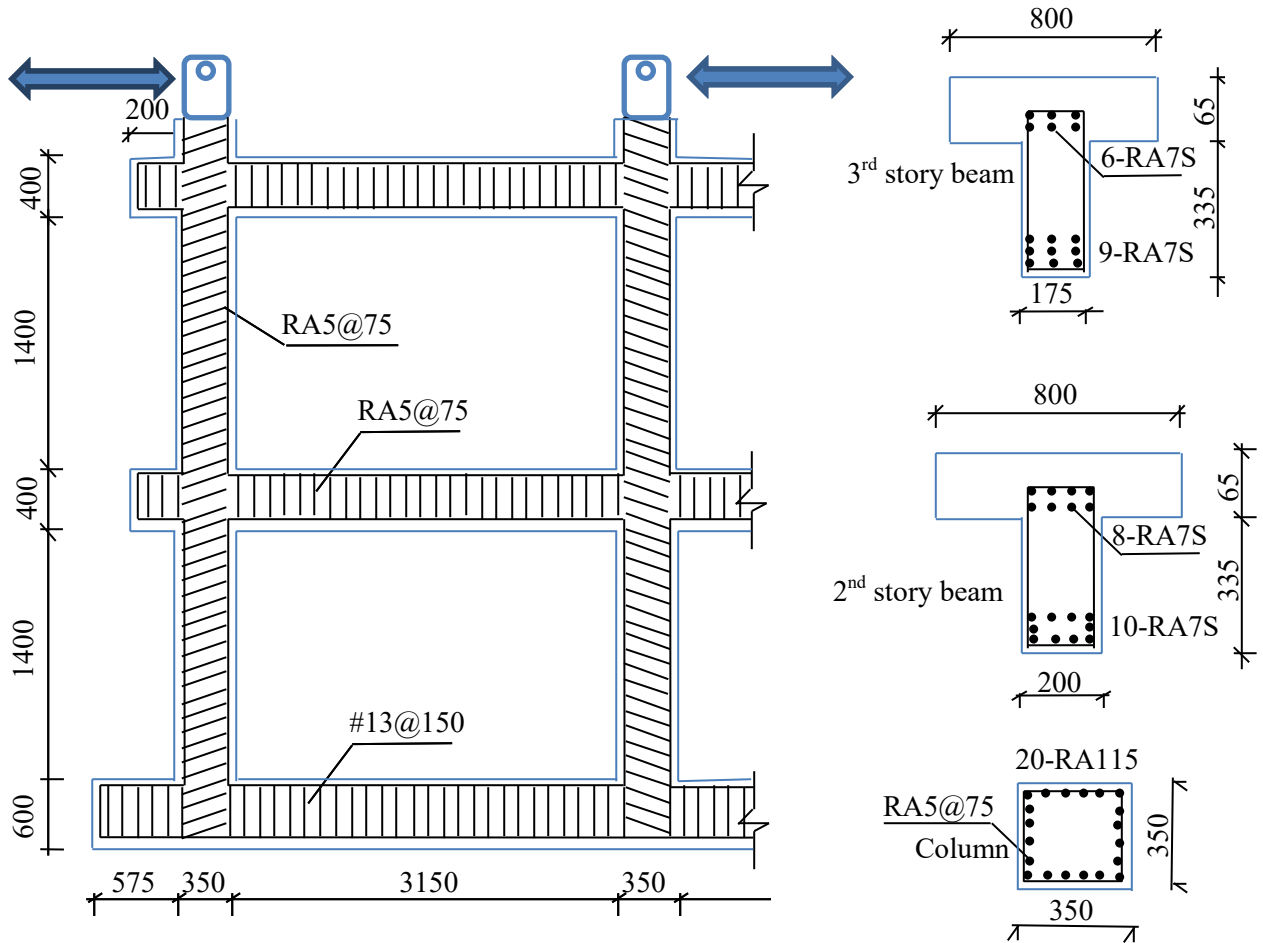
Concrete dimensions and reinforcement details (Fukuyama and Masude 1995)
